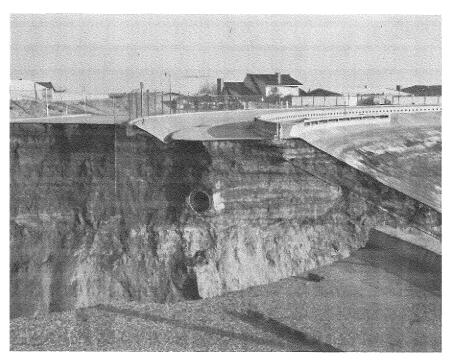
East side of breach showing spillway pipe and reservoir lining, December 22, 1963.
